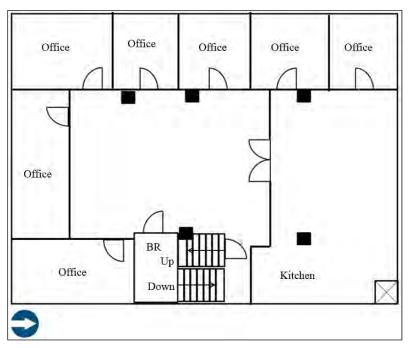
SECOND STORY PLAN (NOT TO SCALE)
